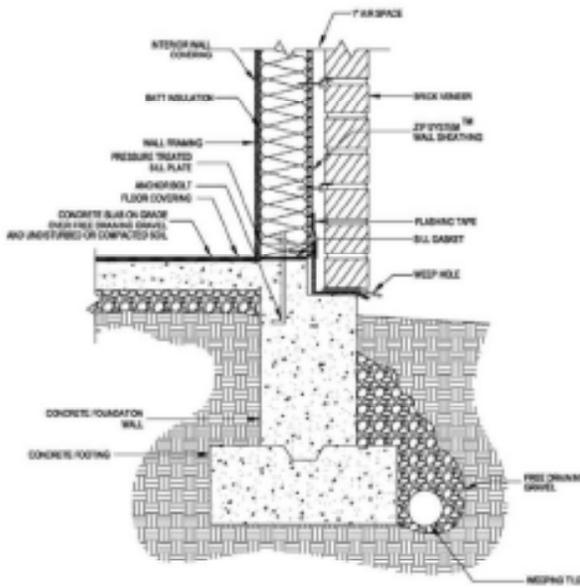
TYPICAL WALL-SILL INTERSECTION AND FLASHING DETAILS FOR BRICK SIDING
